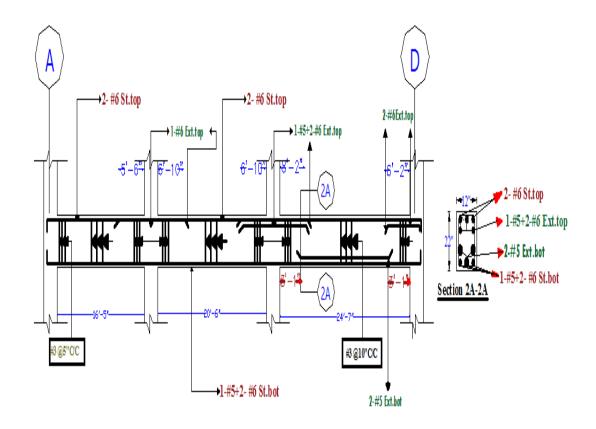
Reinforcement area of Second Floor X-Axis
